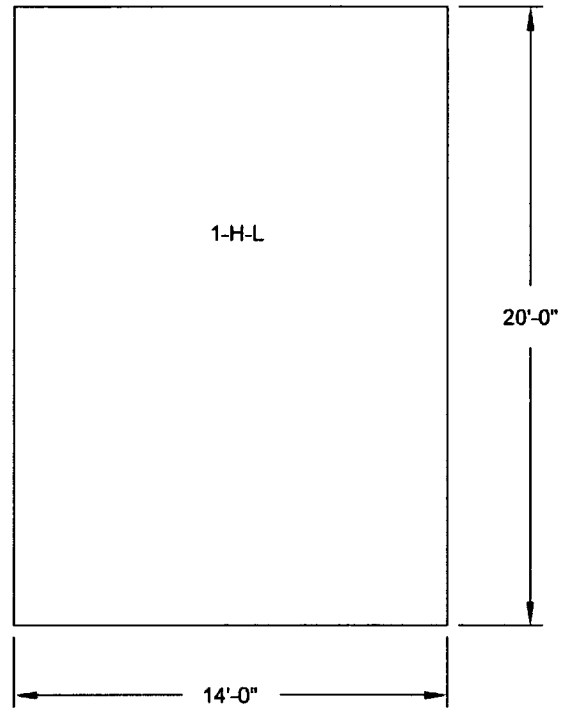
H.6-174 Wall 9 Looking From Outside Vertical Reinforcement Zones
